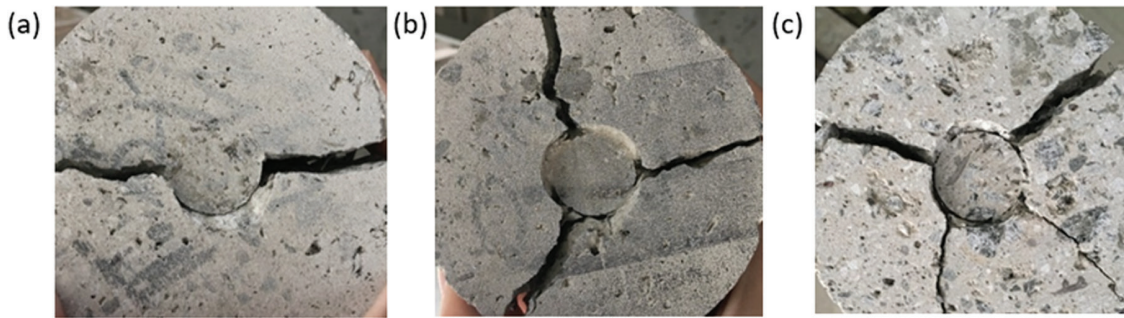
Most common fracture mechanisms occurred in the DPT: (a) two radial fractures; (b) three radial fractures; and (c) four radial fractures.
